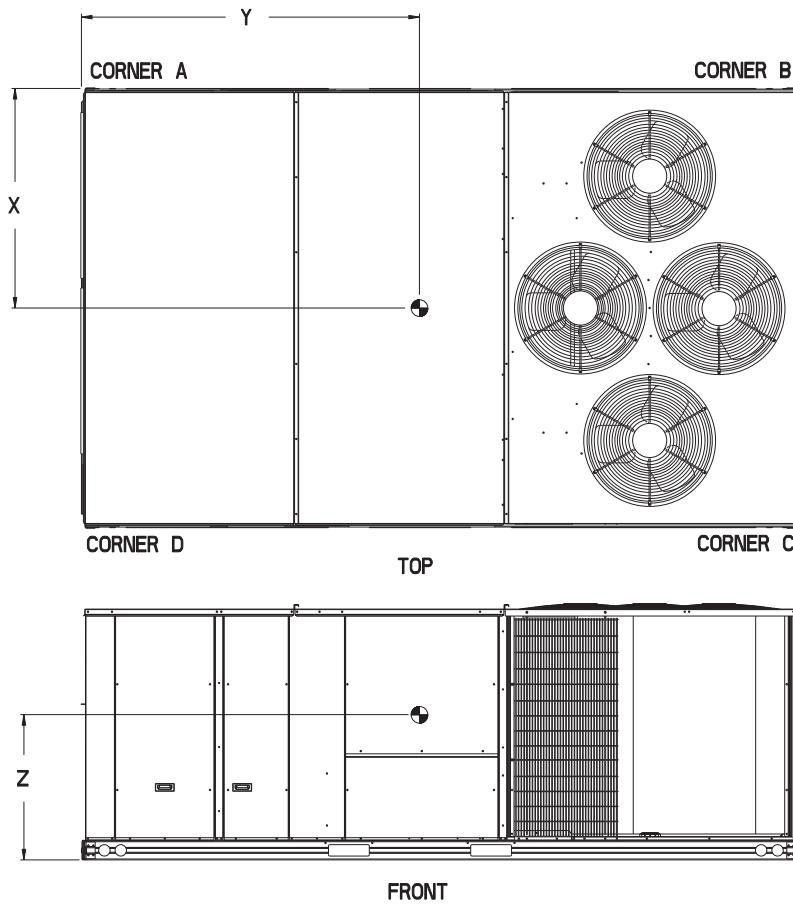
Unit Dimensional Drawing – Size 24 Unit
